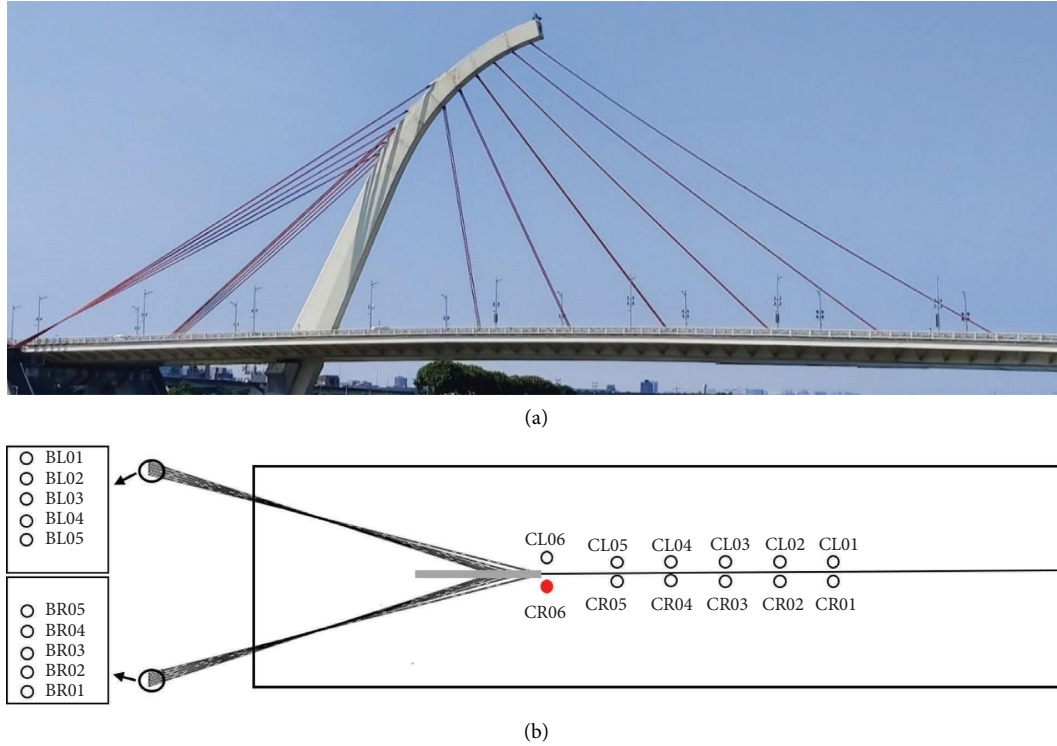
Da-Chih Bridge and its cable arrangement. (a) Photo. (b) Cable arrangement.
